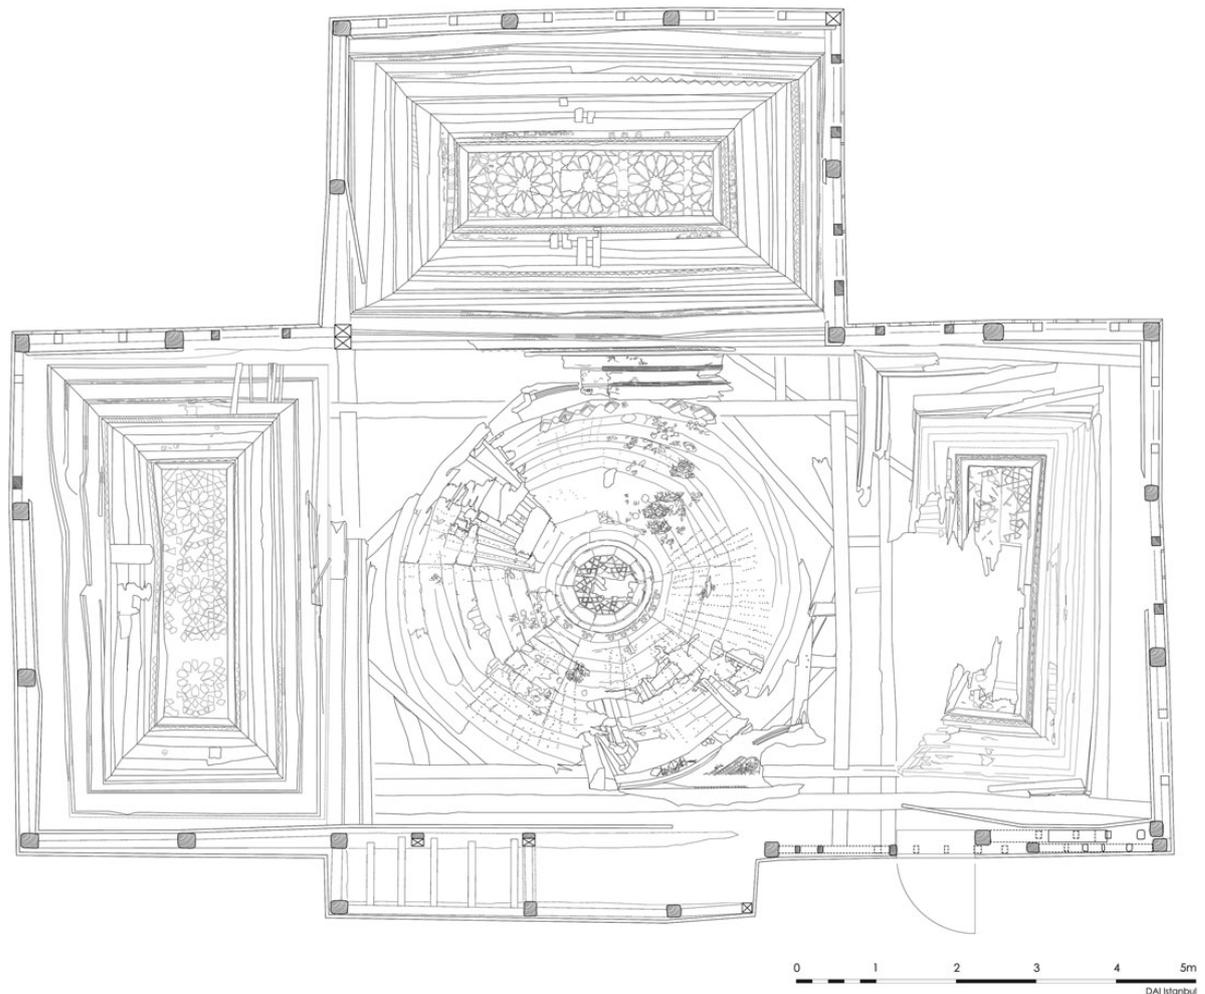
Reflected ceiling plan of the Divanhane, building documentation 2008 (Drawing Secil Tezer, DAI)
